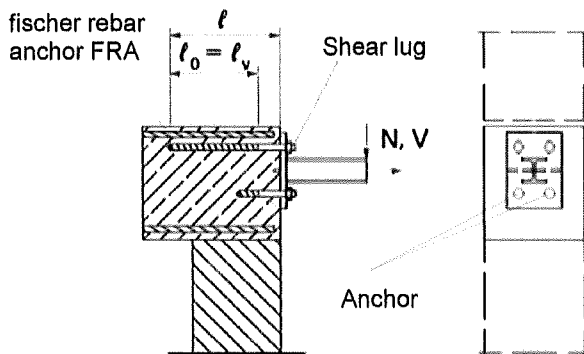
Lap of the anchoring of cantilevered buildings. In the anchor plate, the drill holes for the rebar anchors have to be designed as elongated holes with axial direction to the shear load.
